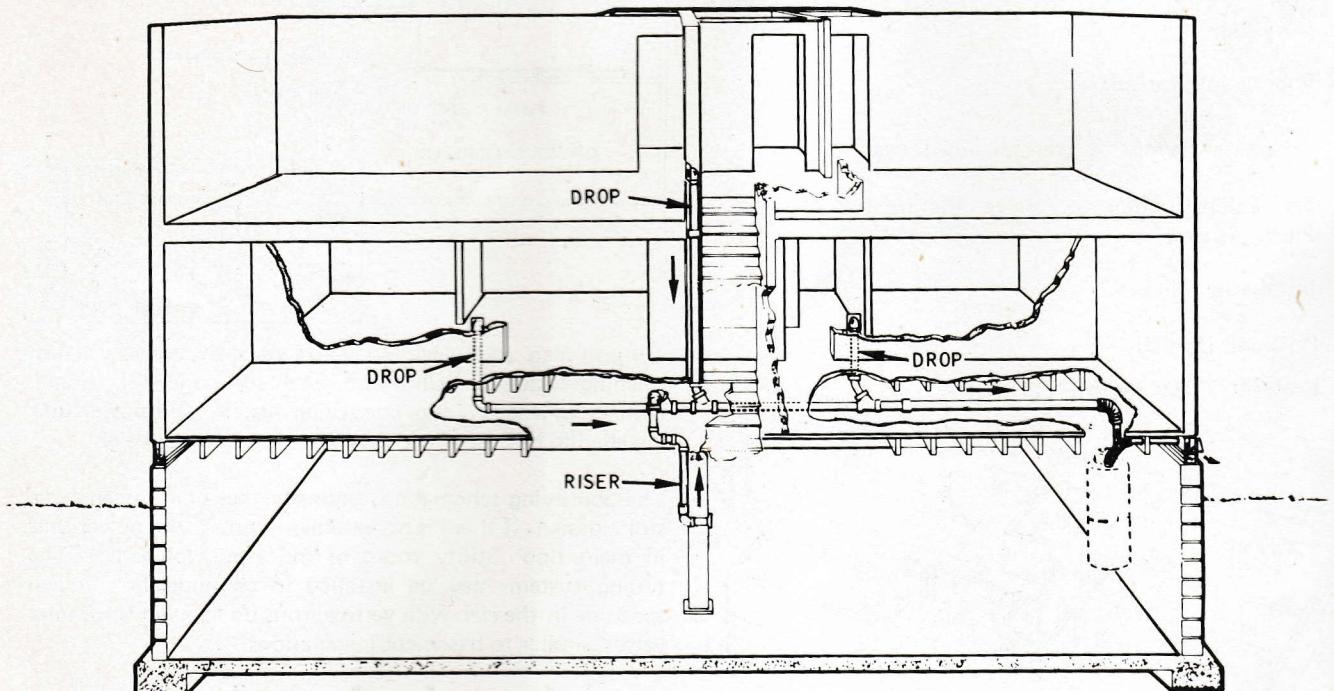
TYPICAL INSTALLATION IN 2-STORY HOME WITH BASEMENT
